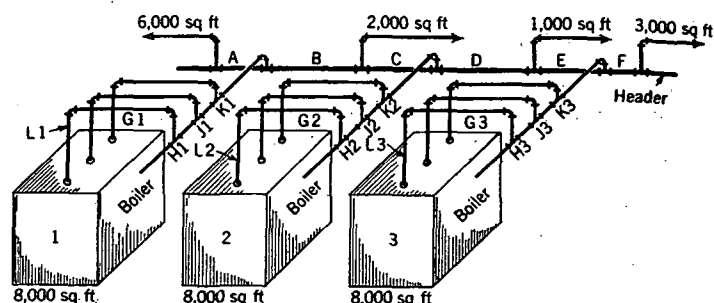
BOILER STEAM HEADER AND CONNECTIONS
